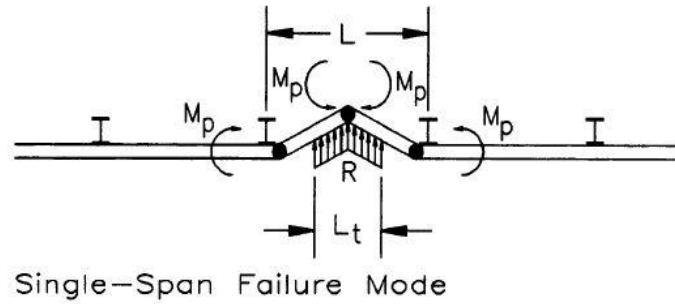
AASHTO Post and Beam Method Failure Mechanisms for Bridge Rail Interior Sections [14]
